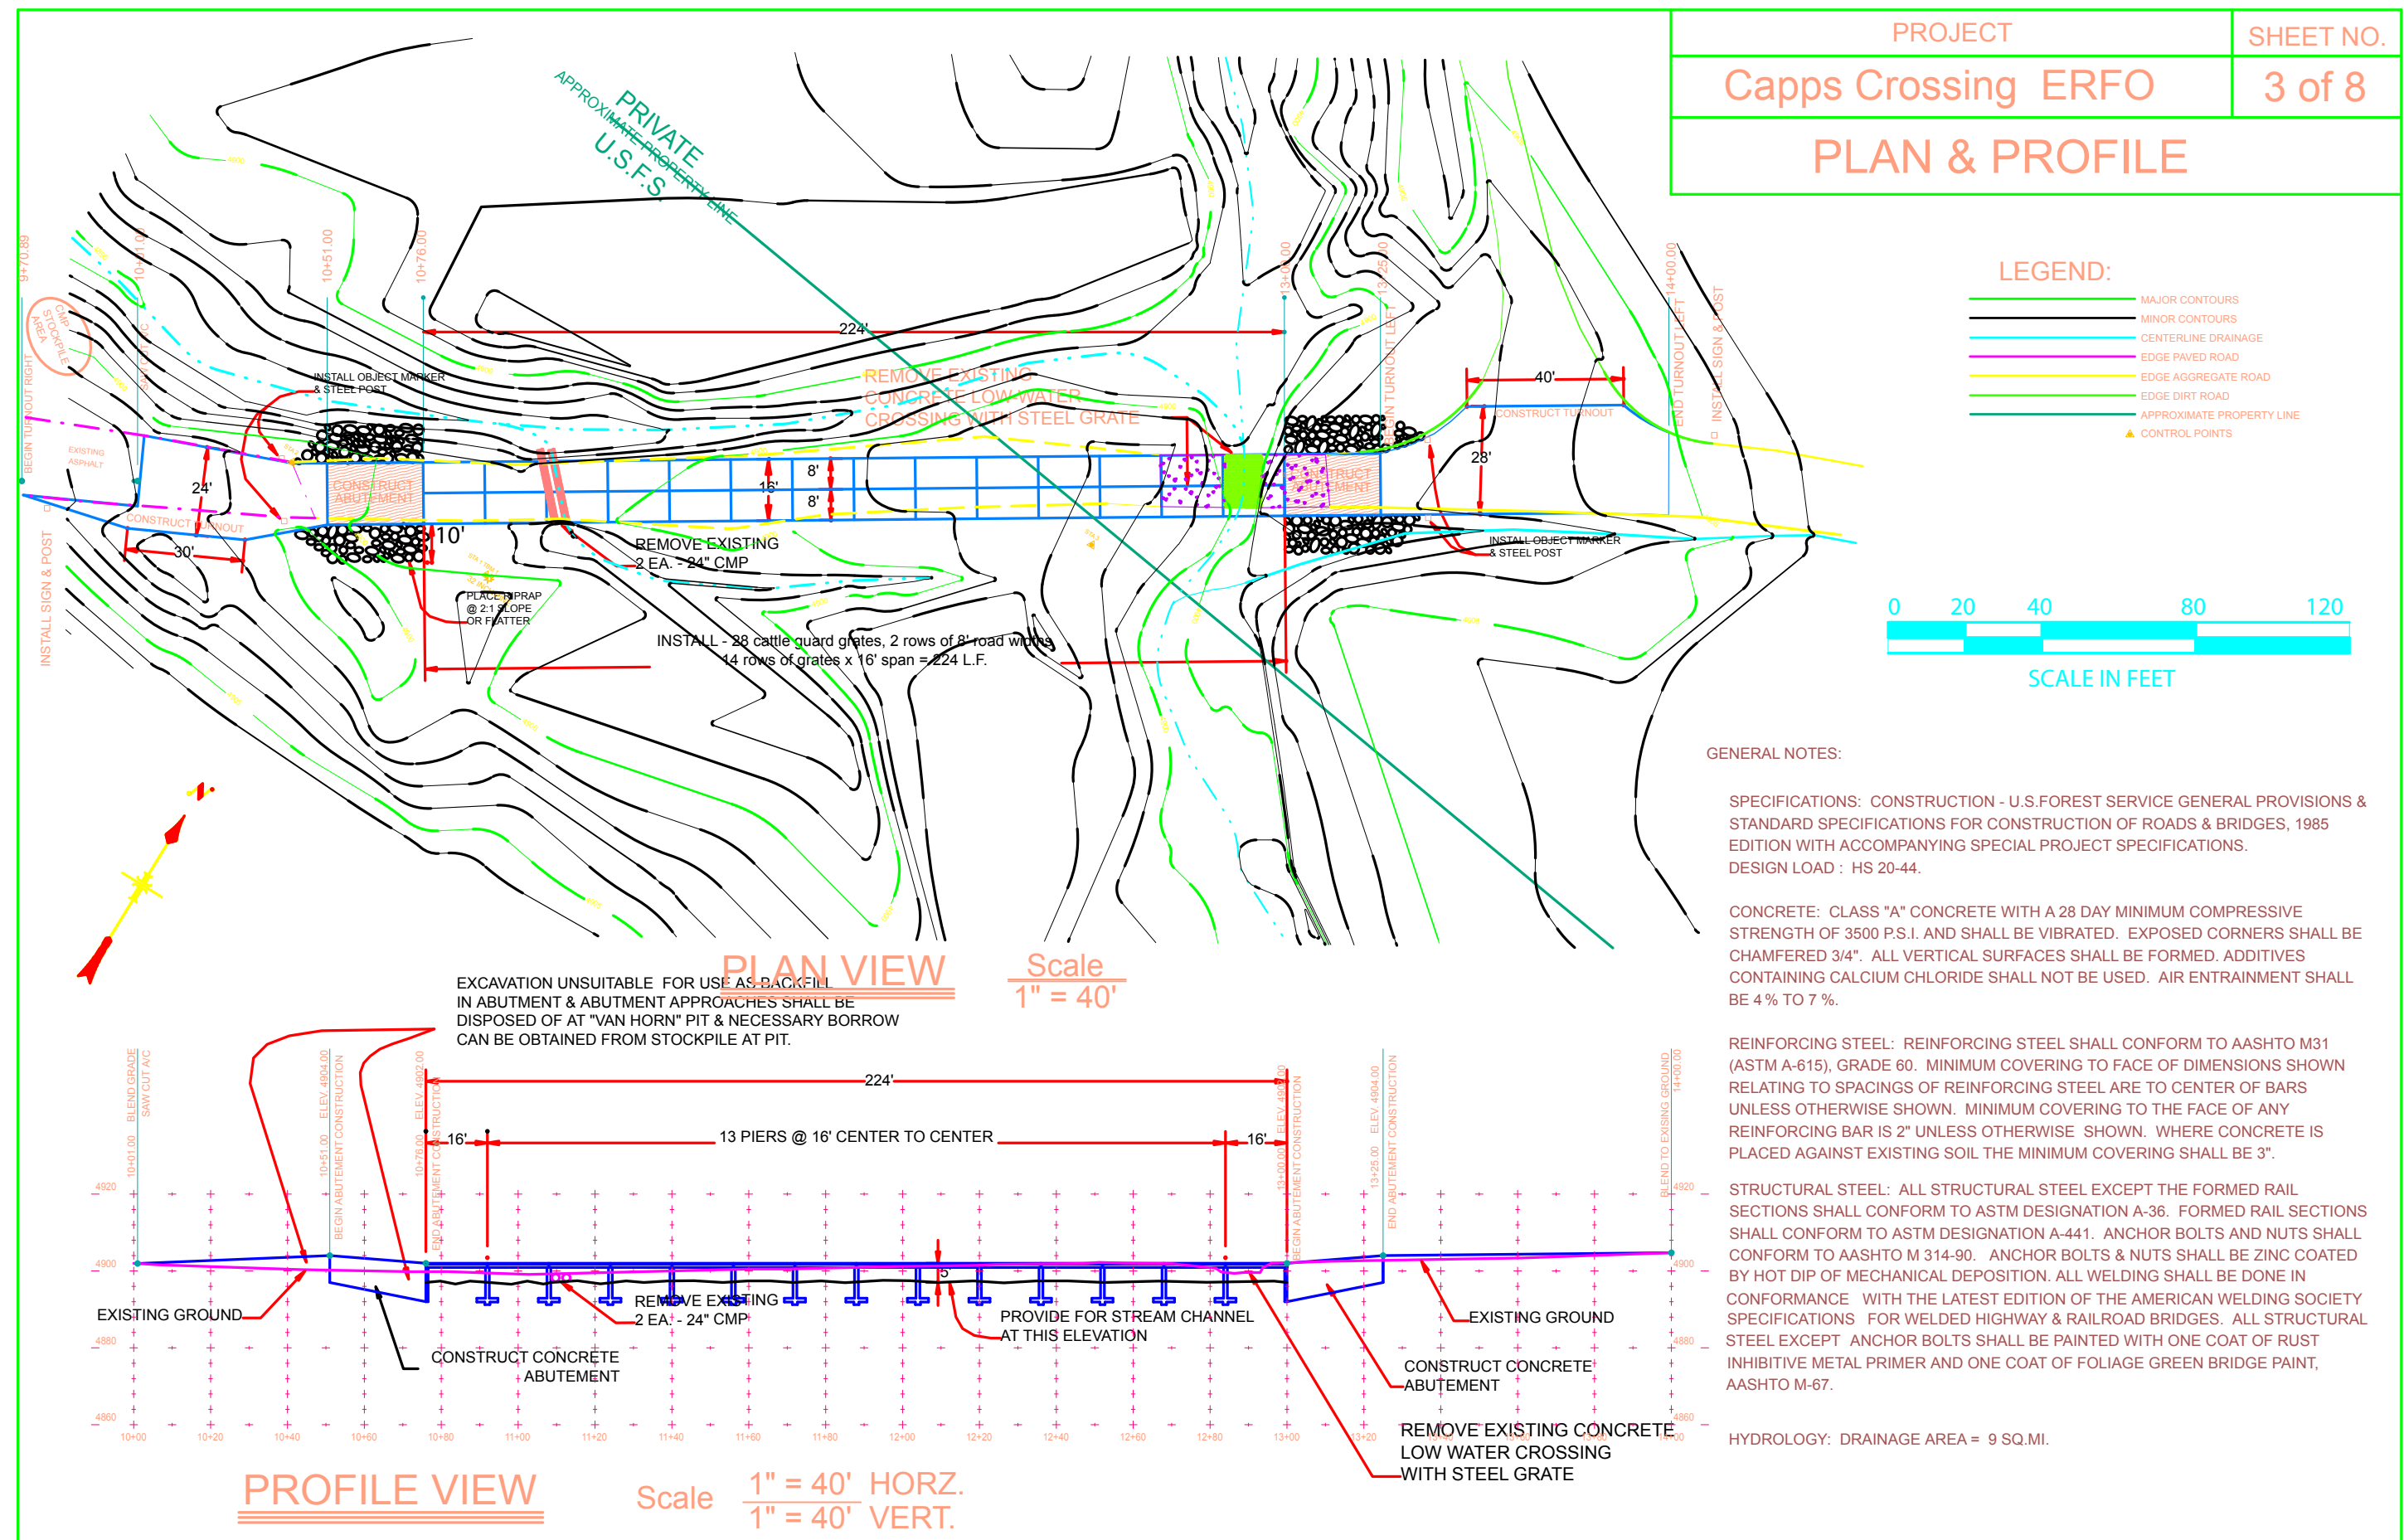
Site plan and cross section for Capps Crossing replacement project.
